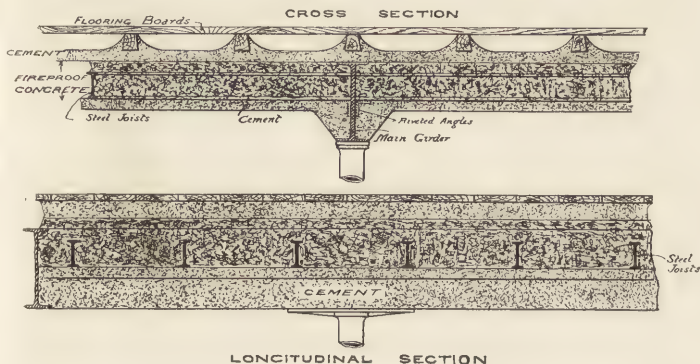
SECTION GIVING DETAILS OF FIREPROOFING.
